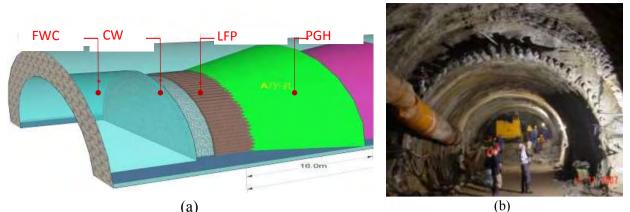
(a) Indication of Forepole Working Chamber (FWC), Concrete Wall (CW), Long Forepoles (LFP) and pre-grouting holes (PGH). (b) Forepoling with a half circular fan of jetgrouted tube of Φ 108 x 6 mm, 18m in the roof of the service tunnel through F_1 trough.
